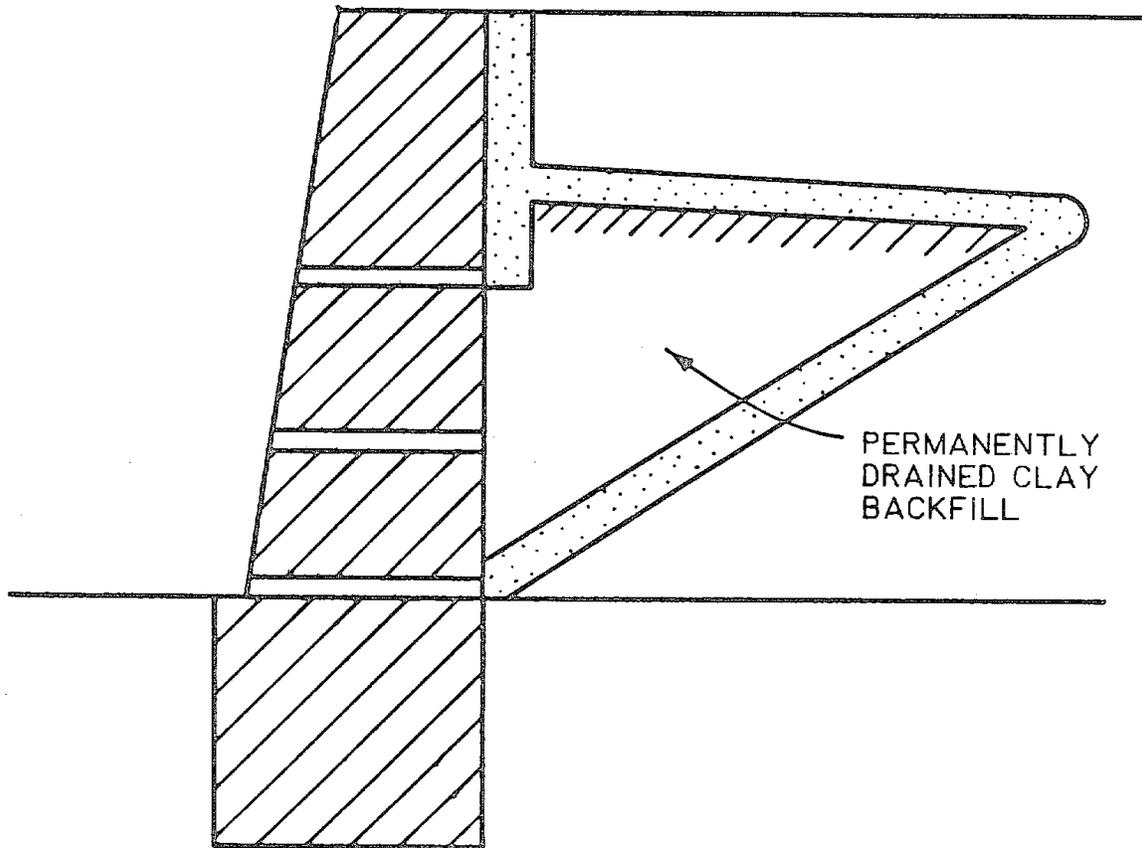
Drainage system to prevent frost penetration behind retaining wall (after Department of the Navy 1982a)
